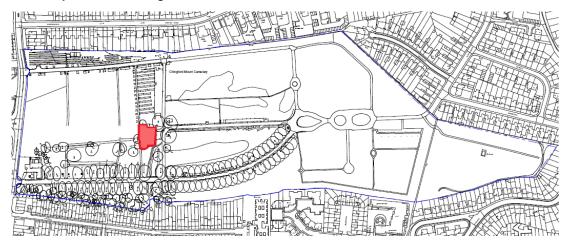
Location Plan of cemetery and proposed crematorium (in red)
